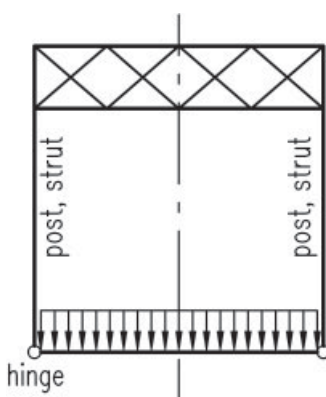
Hinges at the intersections between cross-beams and main truss bottom chords
